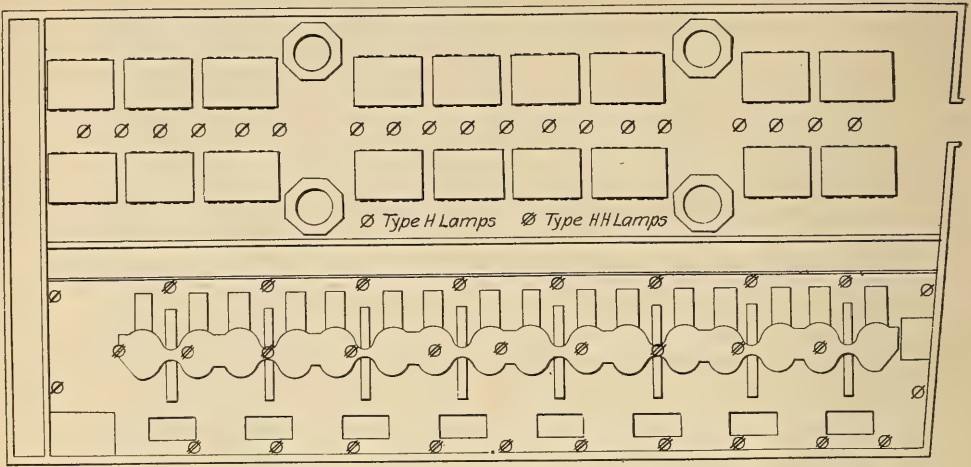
FLOOR PLAN, SHOWING ARRANGEMENT OF UNITS.
